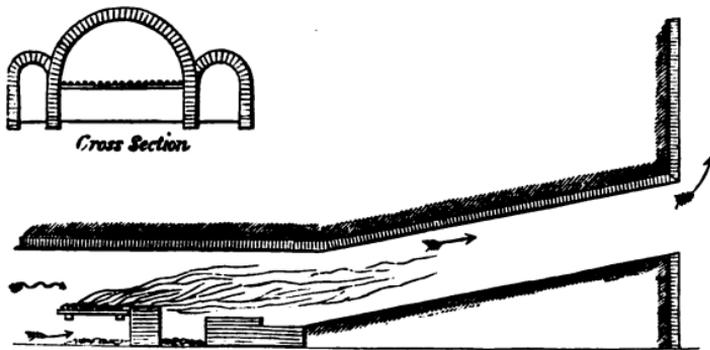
Ventilating Furnace, in longitudinal and cross-section.
